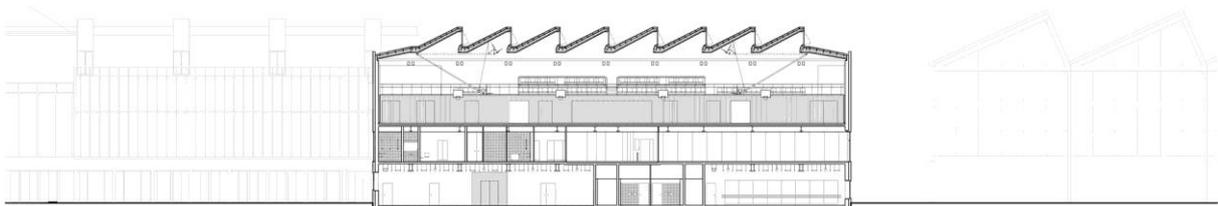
Longitudinal section. From (Archdaily, 2014)
